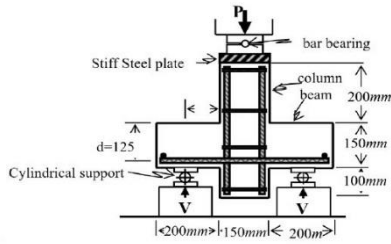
Dimensions and reinforcement details (Mohammad Ali and Attiya, 2012)
